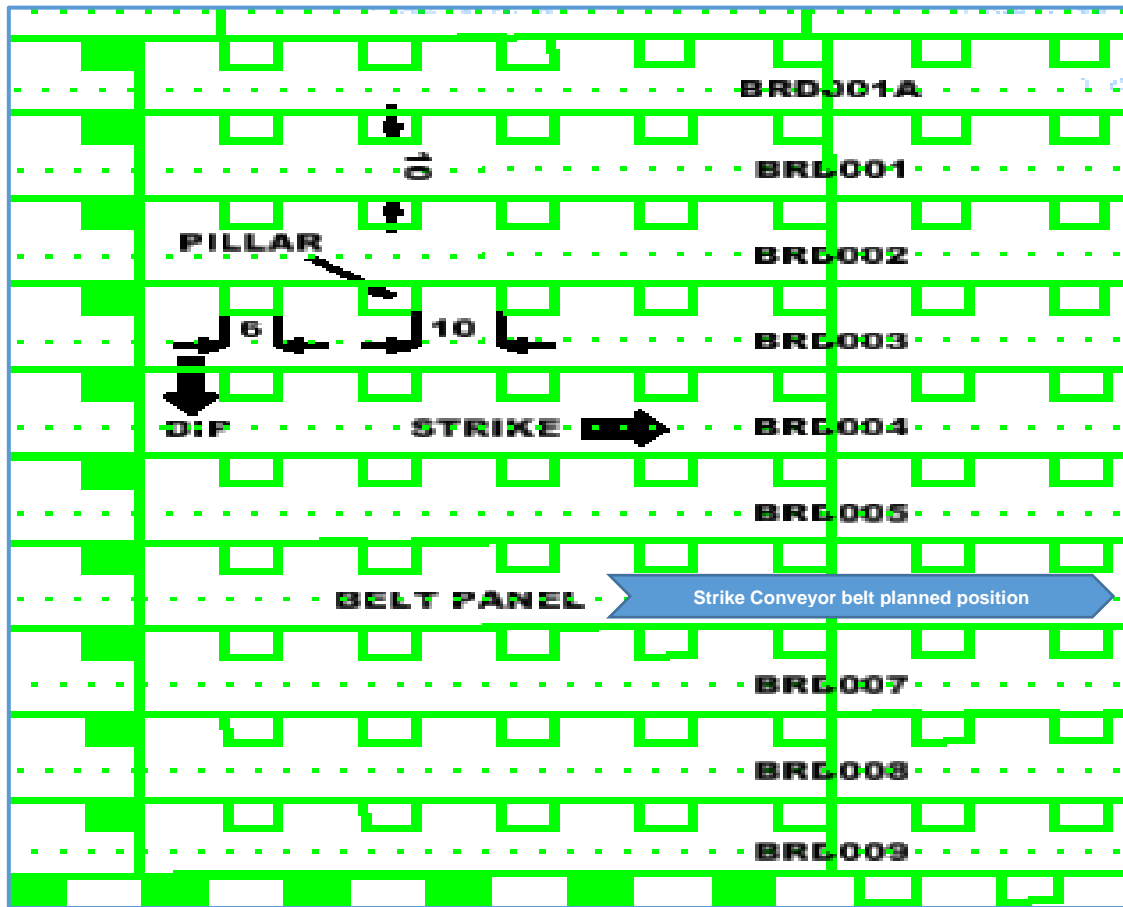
Typical Layout of an LP section mining at Bathopele mine
